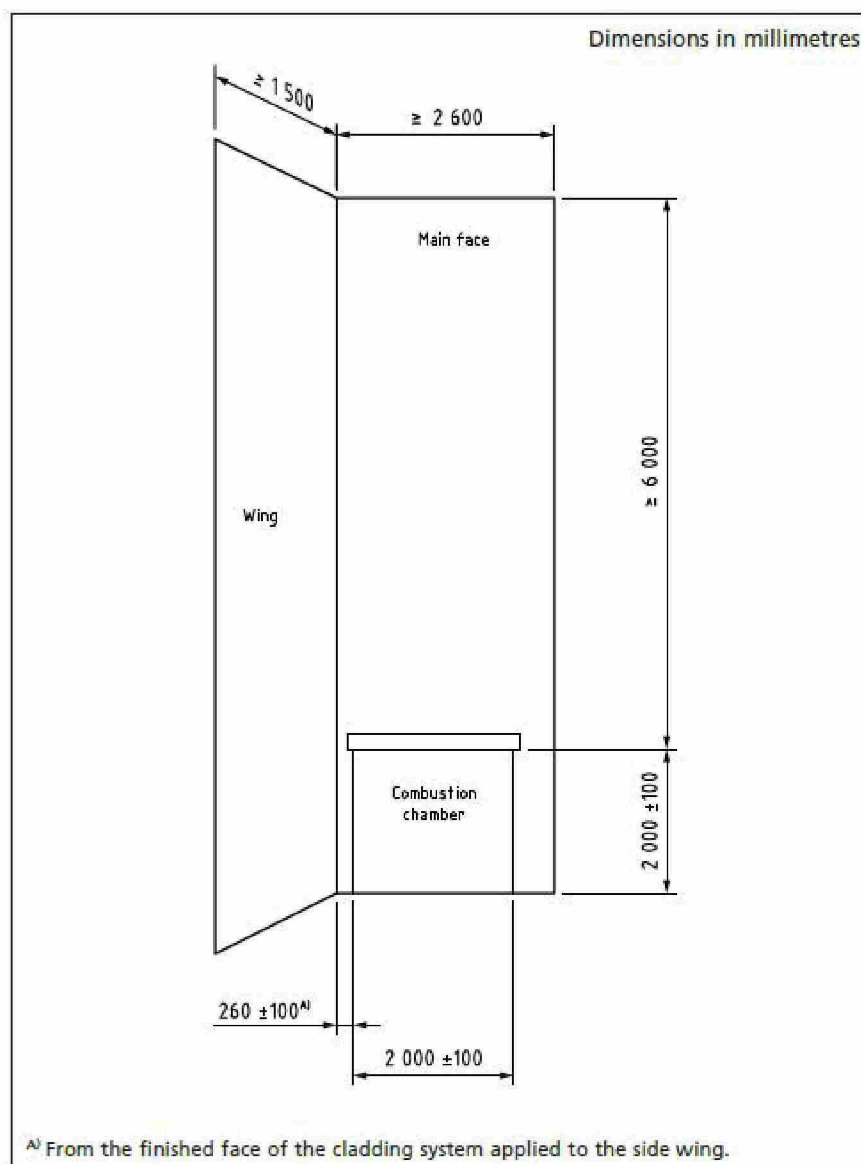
Test apparatus dimensions as specified by test Standard^[1].
